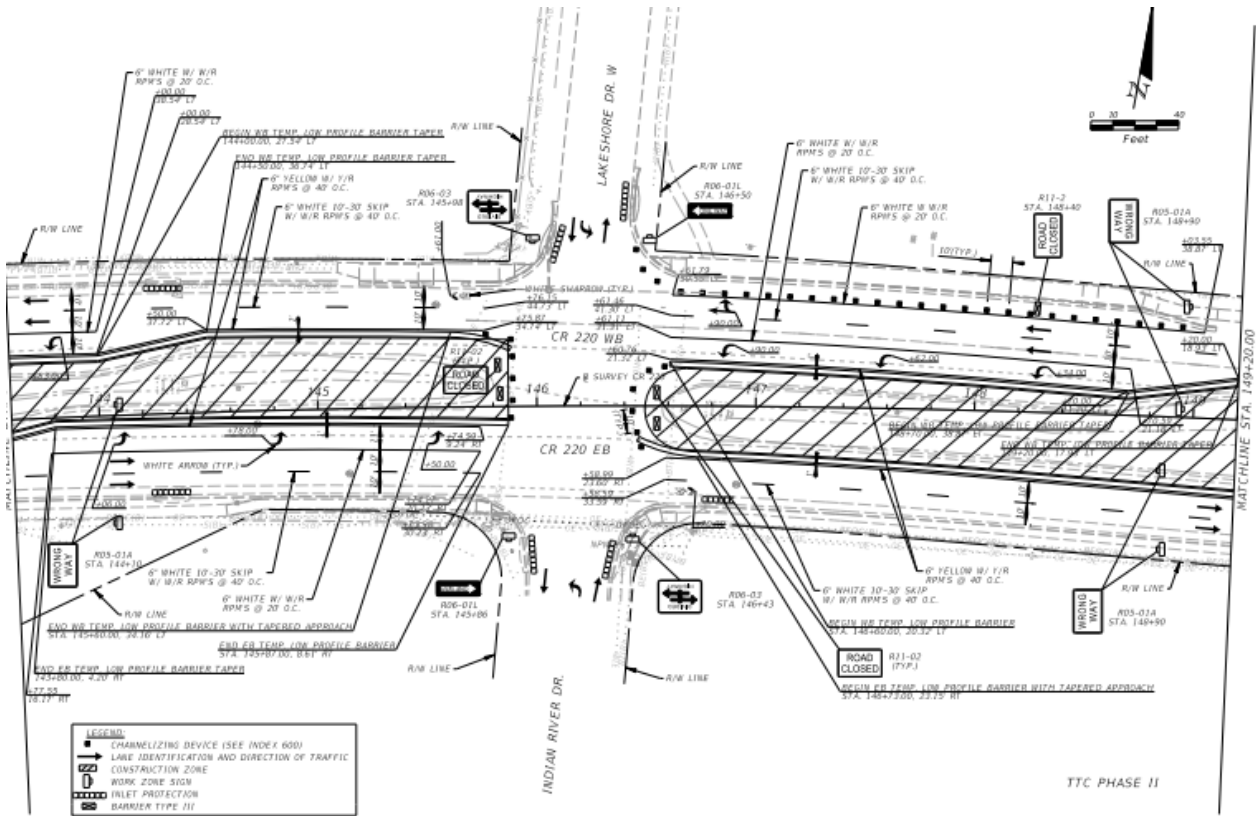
Reconstructed intersection west of CR 220 and Old Hard Road
